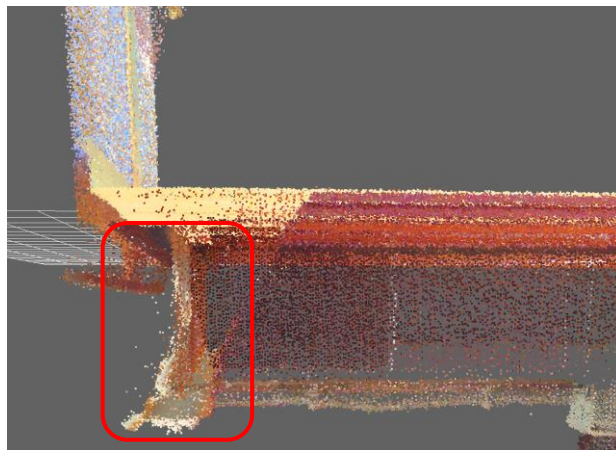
Image. Self-shadowing of flange at beam-to-beam connection
